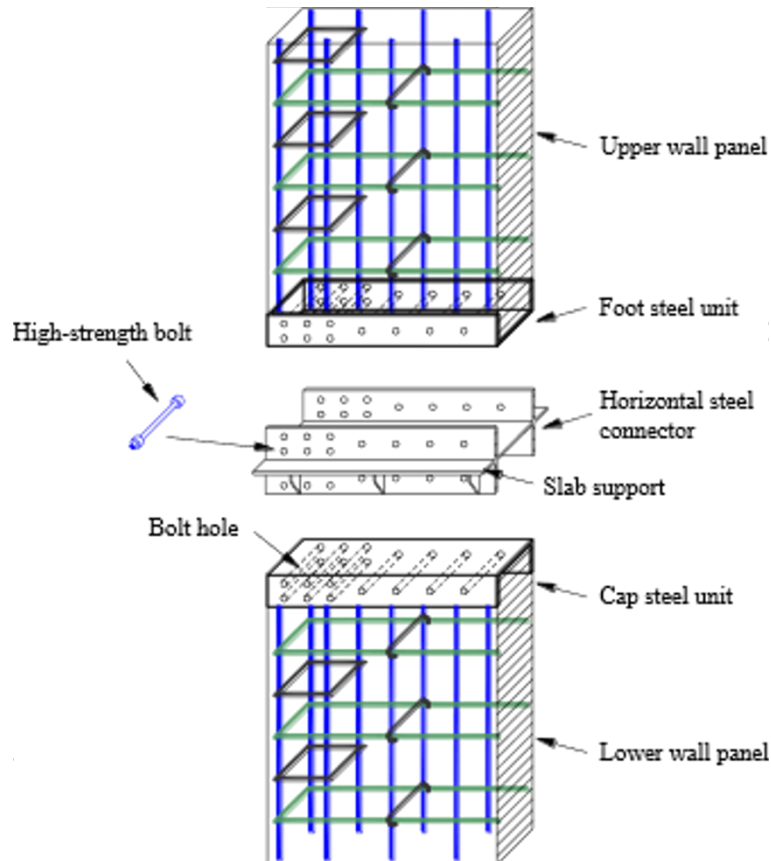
Concrete wall/wall dry connection with a horizontal steel connector and high-strength bolts. Reprinted from Sun *et al.* [31].
